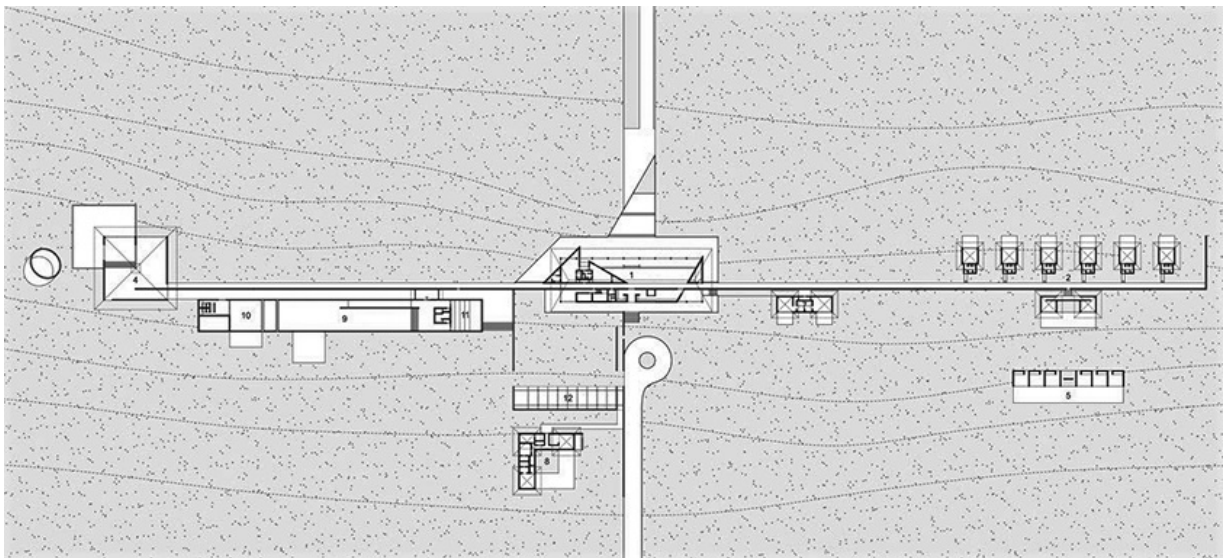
Floor plan of Casa Wabi's main building developed by the BAAQ' Office. Source: BAAQ' Office Team, 2016. Available at: https://www.baaq.net/proyectos/casa_wabi/casa_wabi.html. Accessed 24 Apr. 2021.
